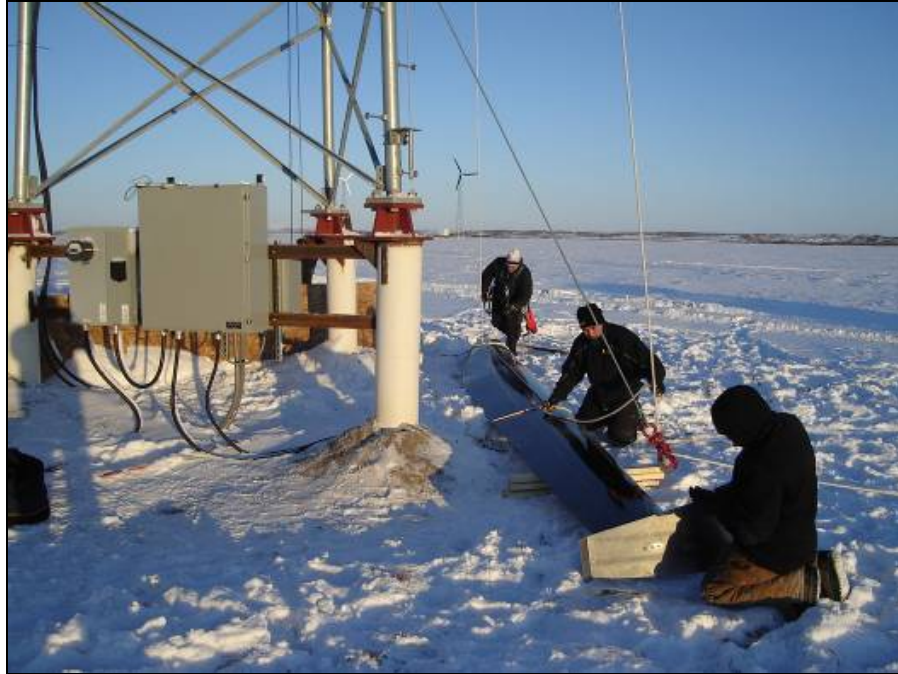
Gravel Around Foundation Pilings for Added Thermal Protection
